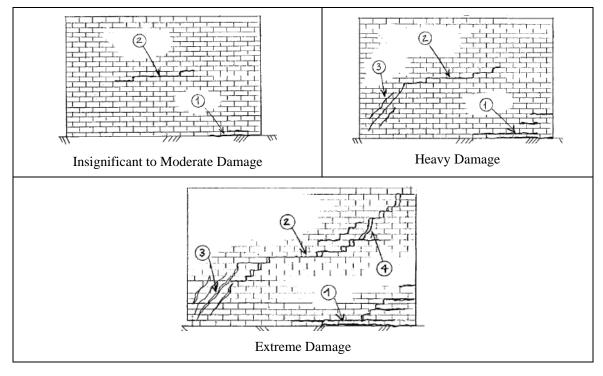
Illustrations on in-plane flexural failure of masonry wall (Flexural Cracking/Toe Crushing/Bed Joint Sliding Case)
